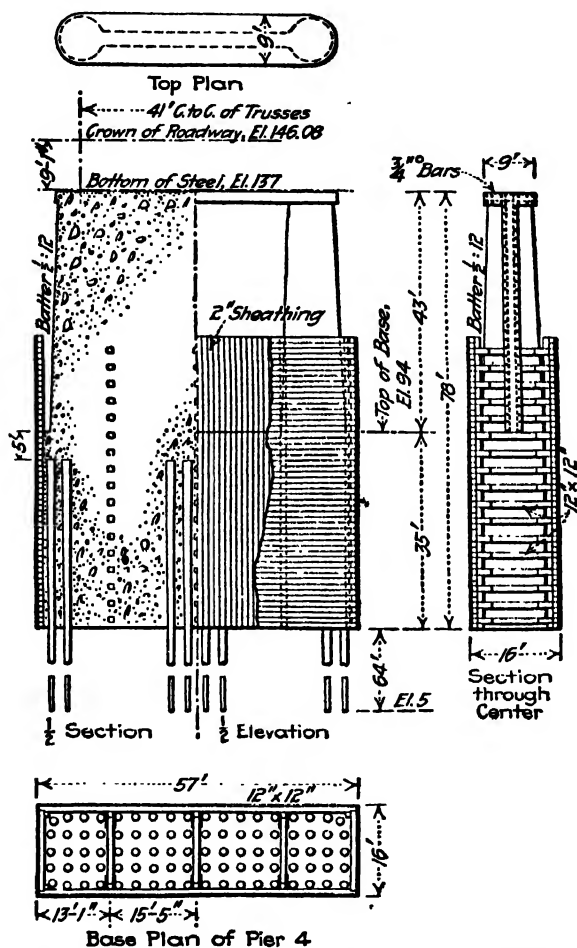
Timber Caisson of Interstate Bridge across Columbia River, Portland, Ore.
